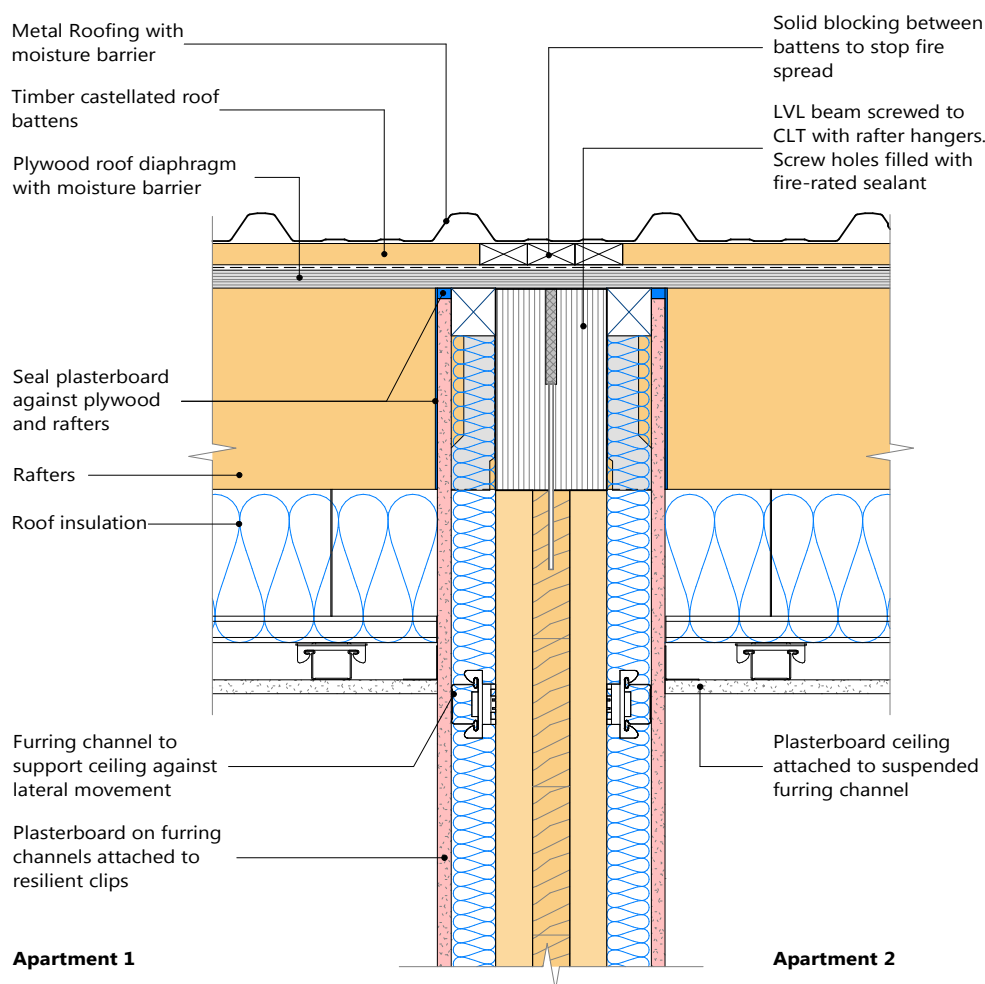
Typical detail for CLT intertenancy wall at underside of roof (rafters perpendicular to wall).
